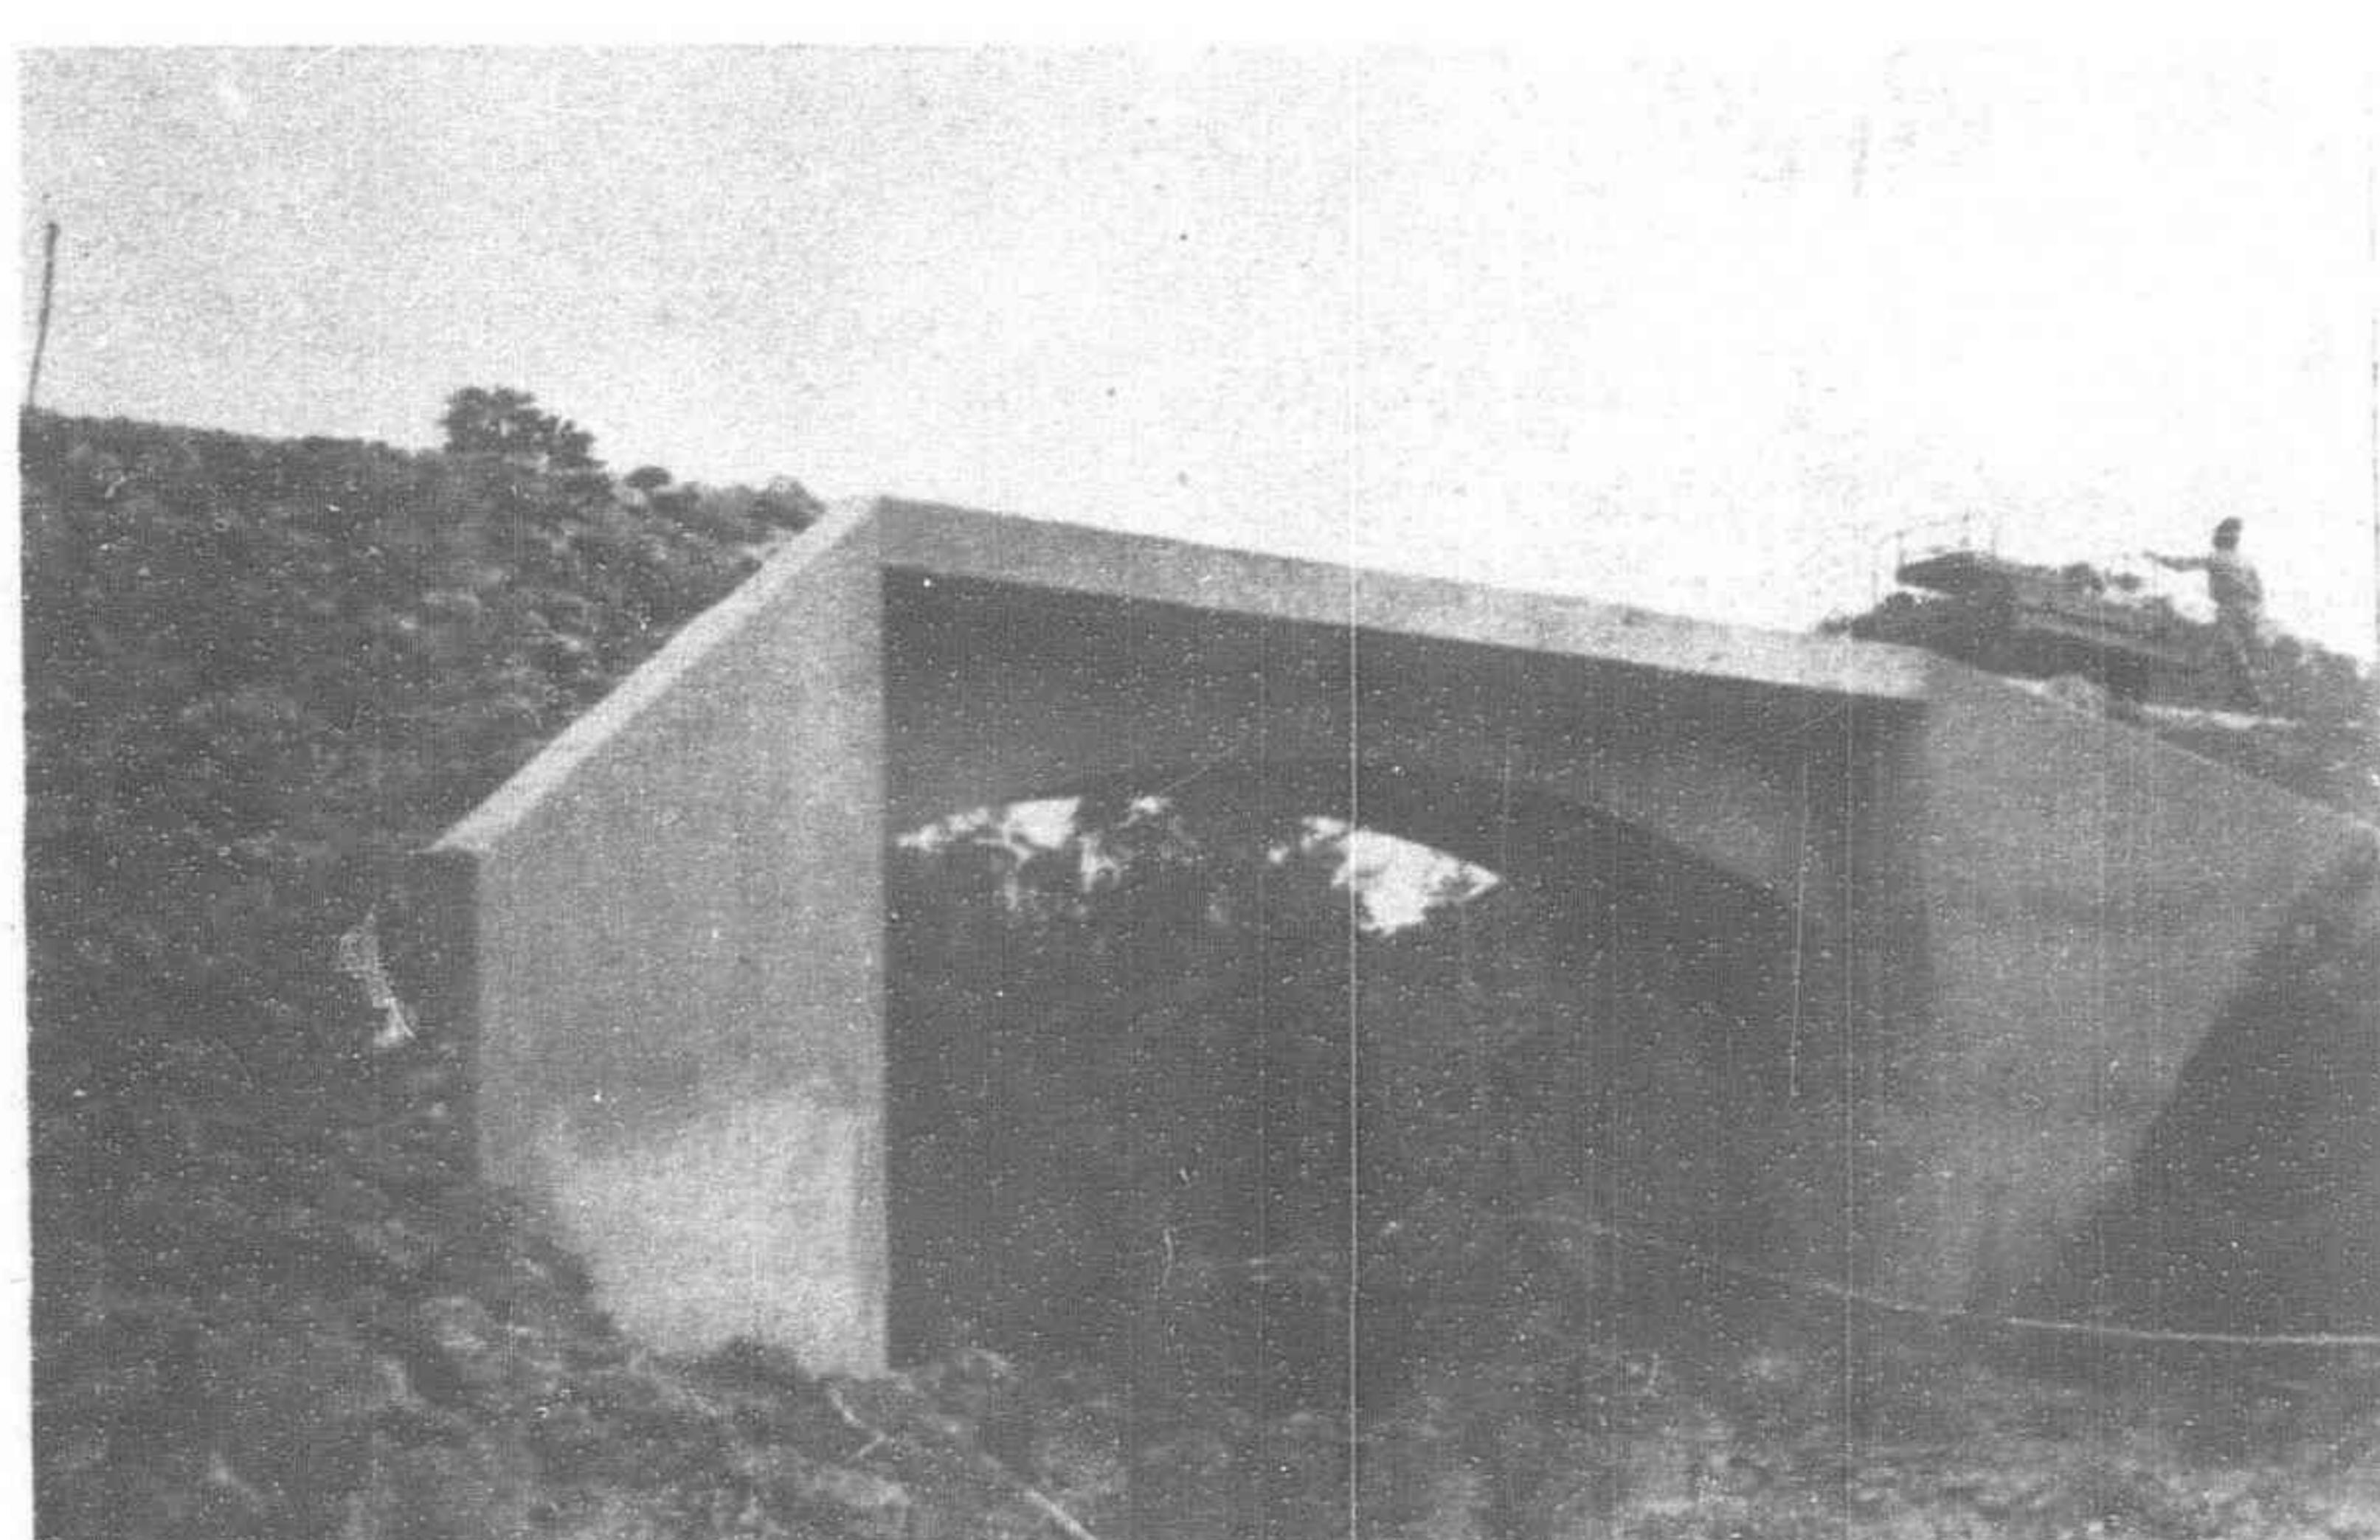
Apali River Bridge, 30-ft. span Rigid Frame, Cantilever Wing Walls
